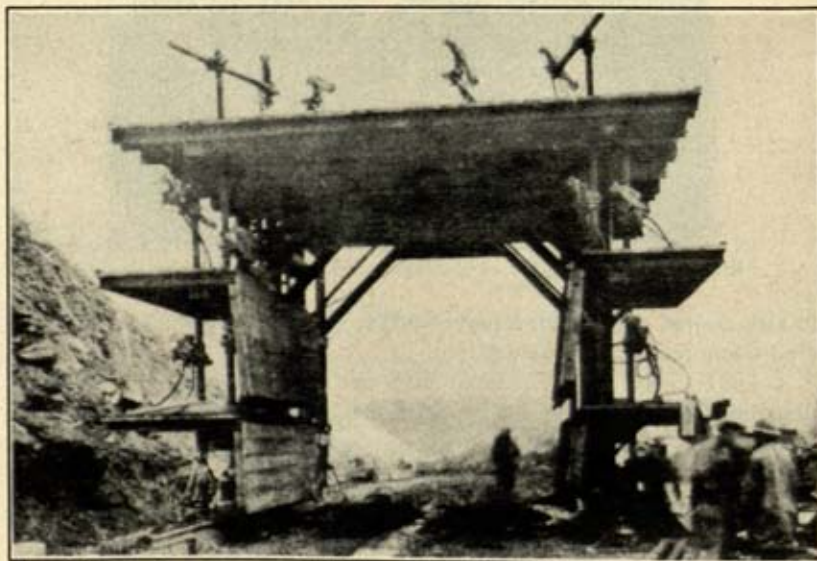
Jumbo mounting 16 drifters, with hinged centers to permit passage of trucks. (*Joy Manufacturing Co.*)
